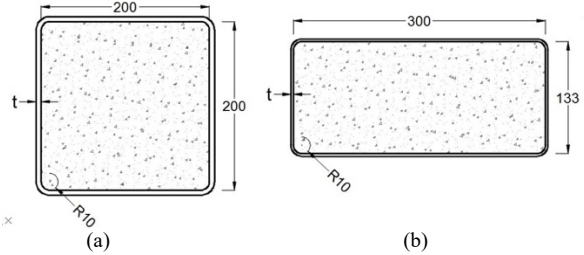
Columns' cross section. a) square column, b) rectangular column
